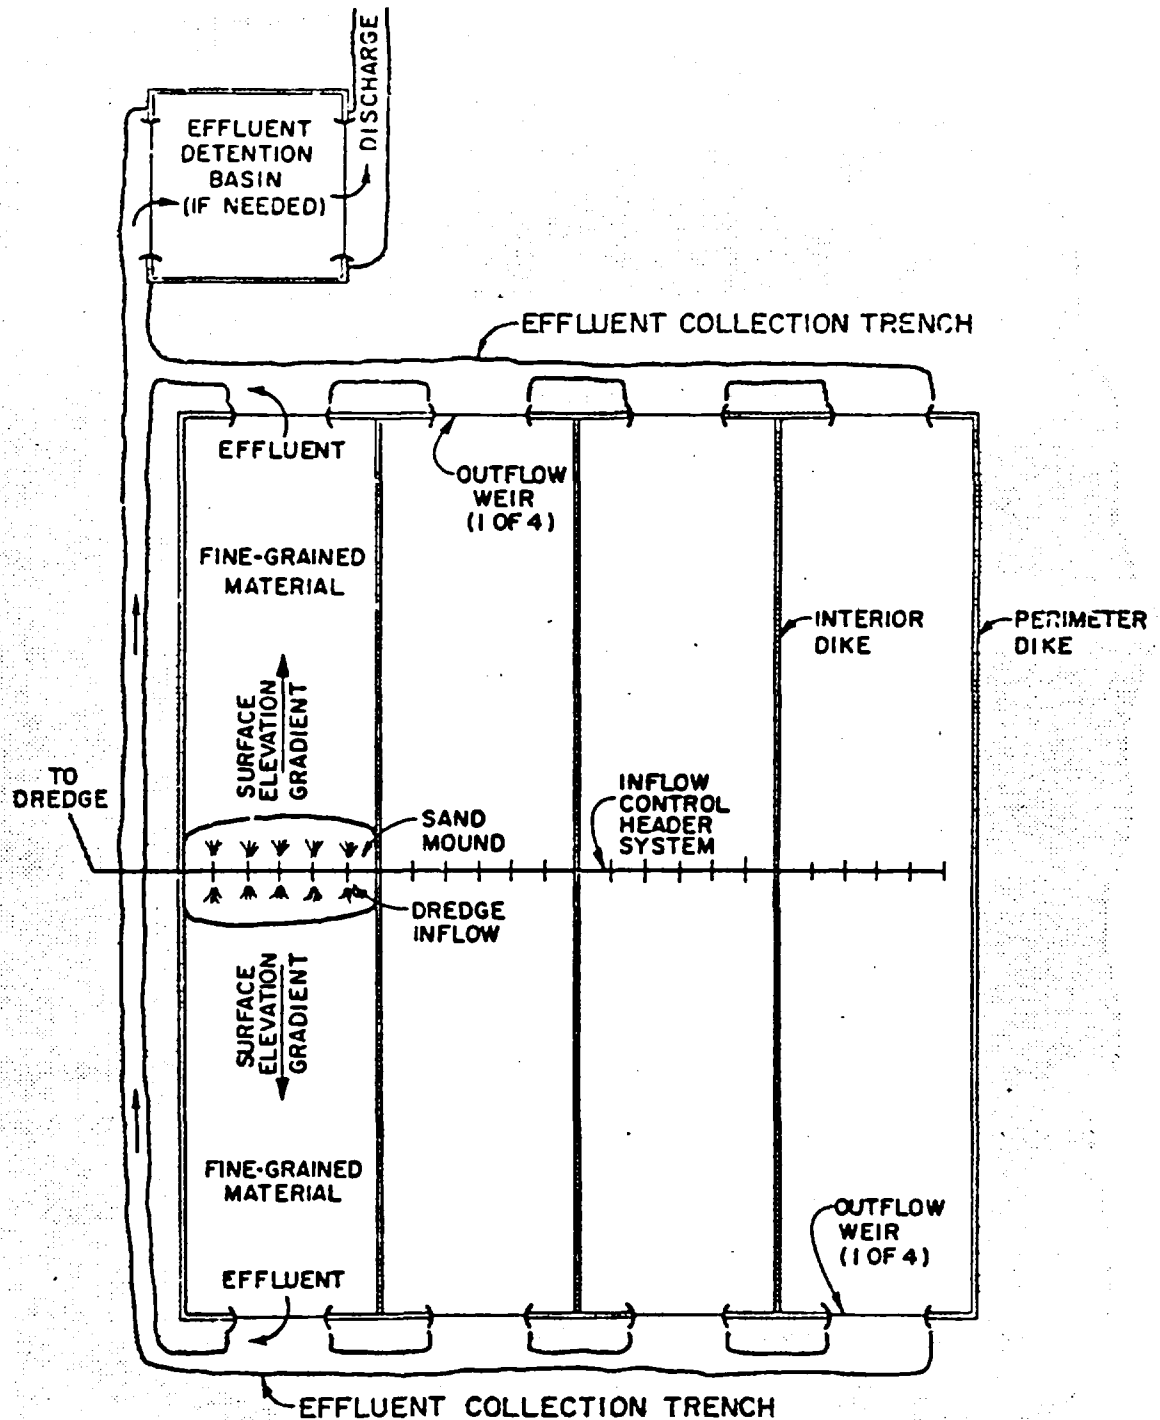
Conceptual illustration of disposal site layout to permit parallel compartment use and produce surface topography facilitating future dredged material dewatering
